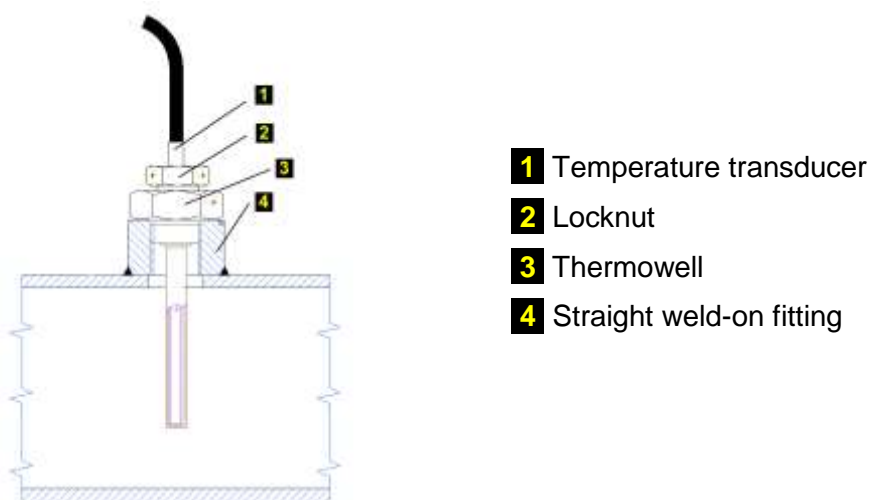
Mounting the temperature sensor using a straight weld-on fitting
